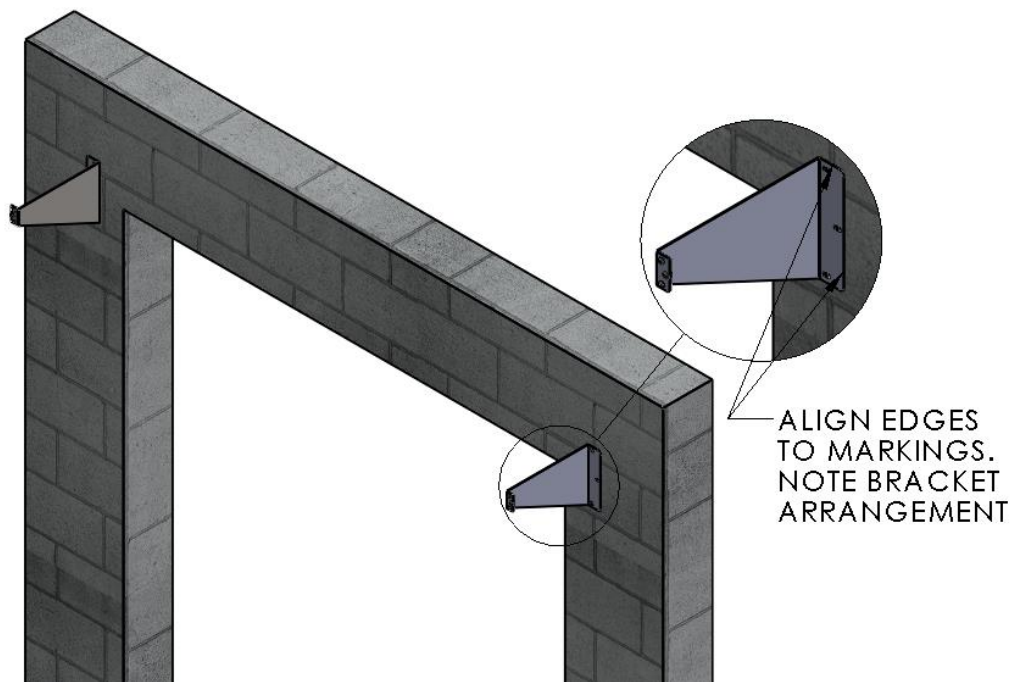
LOCATE/INSTALL HEADER OFFSET MOUNTING BRACKET
